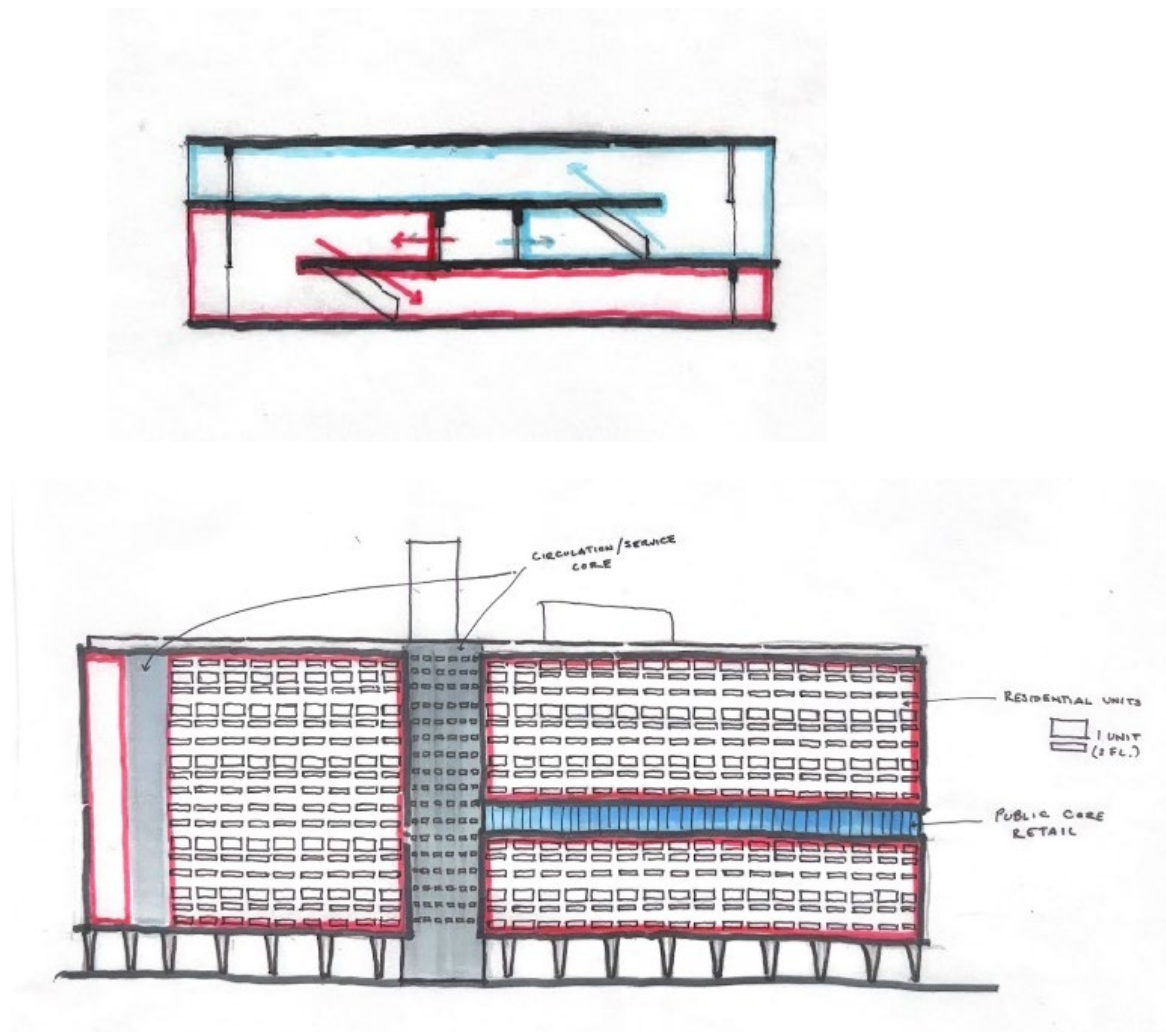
An apartment section and building facade with functions labeled. Image Credit: Author
